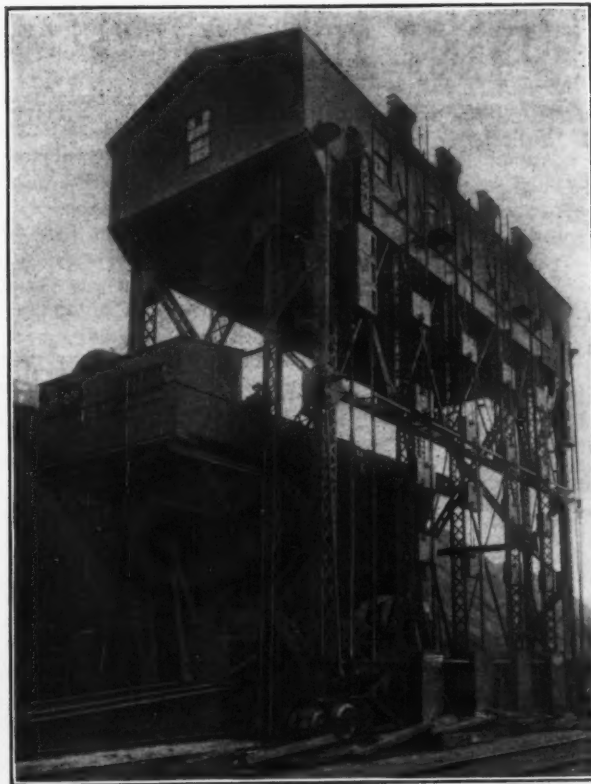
A Three-quarter View, Showing the Side Carrying the Counterweights.
